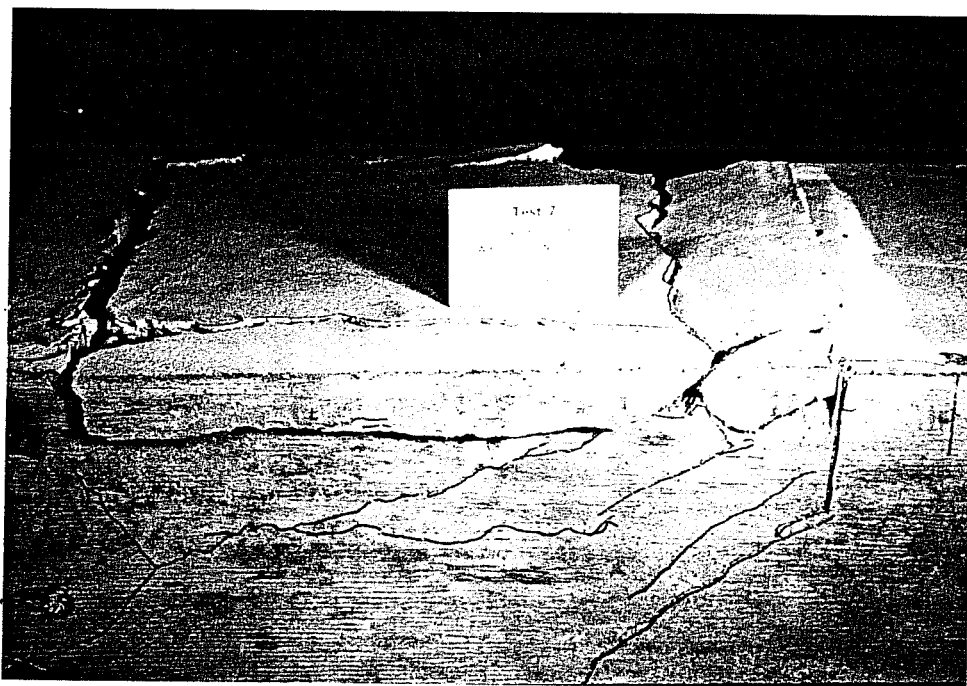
Failure mode of one layer of bundled bars without transverse reinforcement, shear in anchorage zone (Test 7 1-24-S-T)
